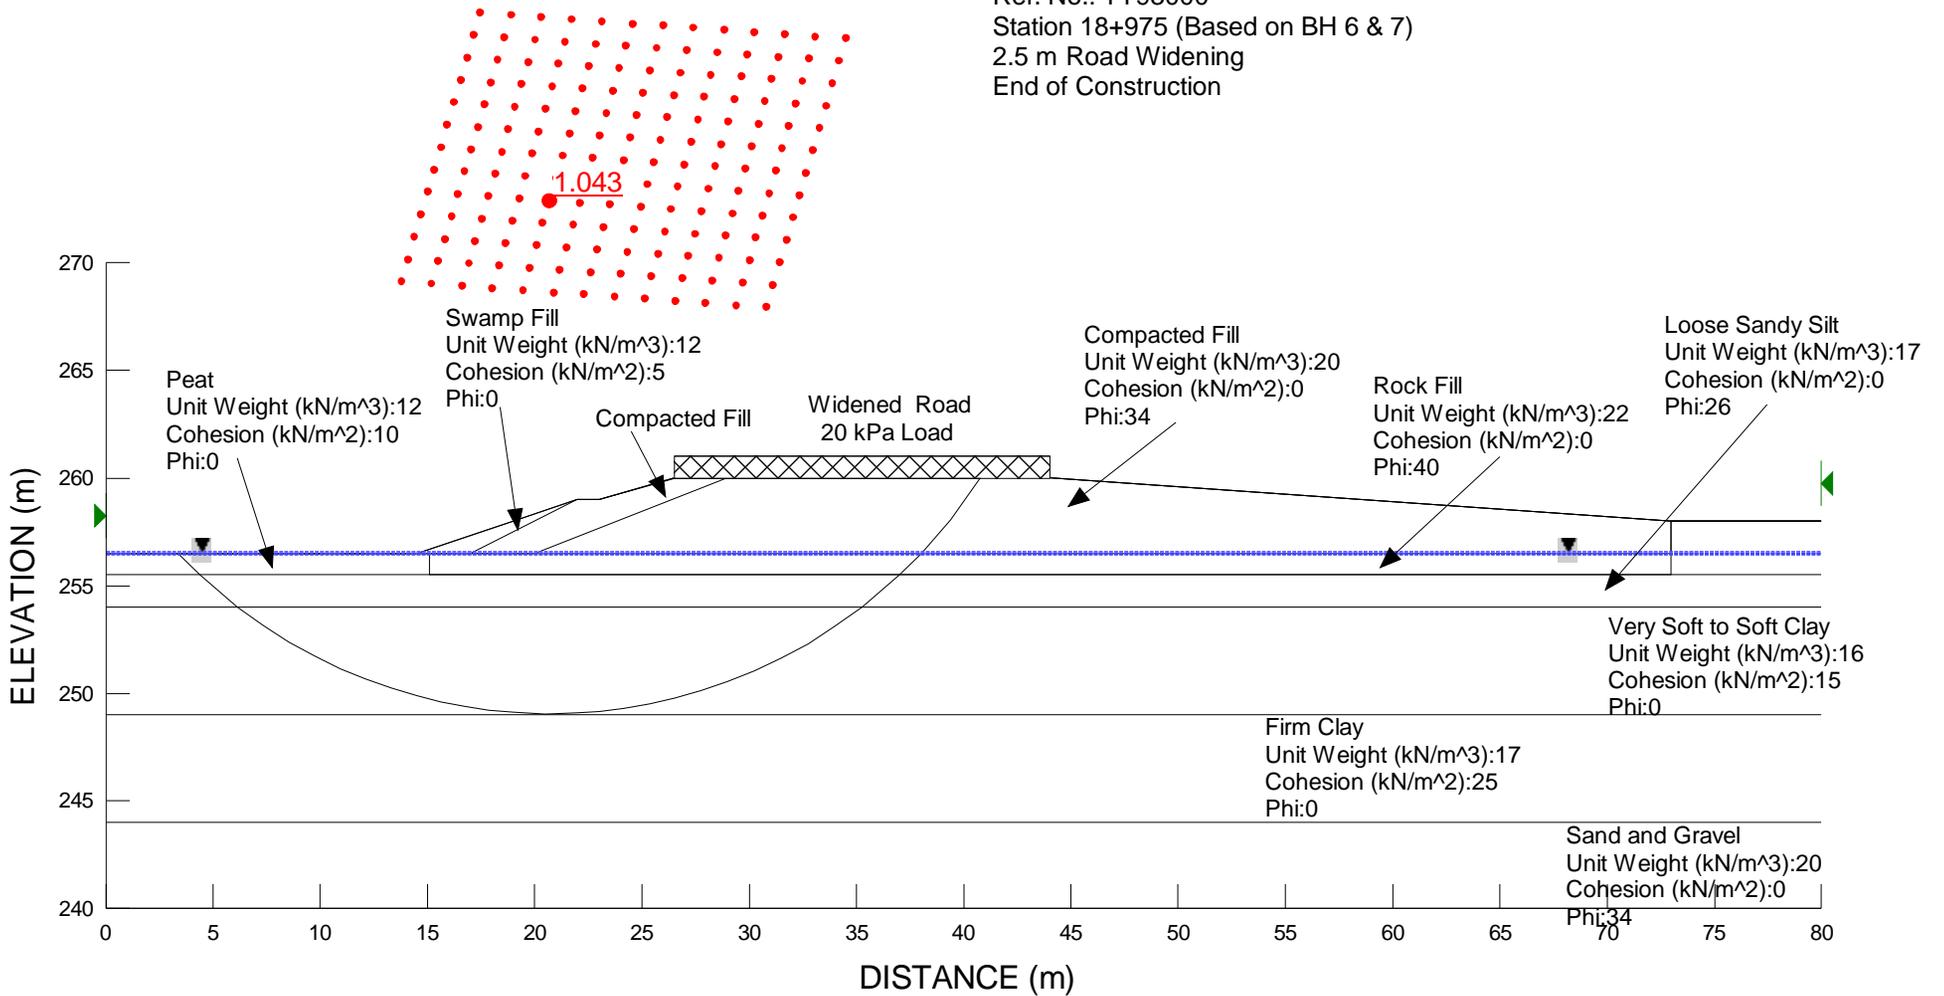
Slope Stability Analysis of Section at Station 18+975 with 2.5 m Road Widening (End of Construction)
